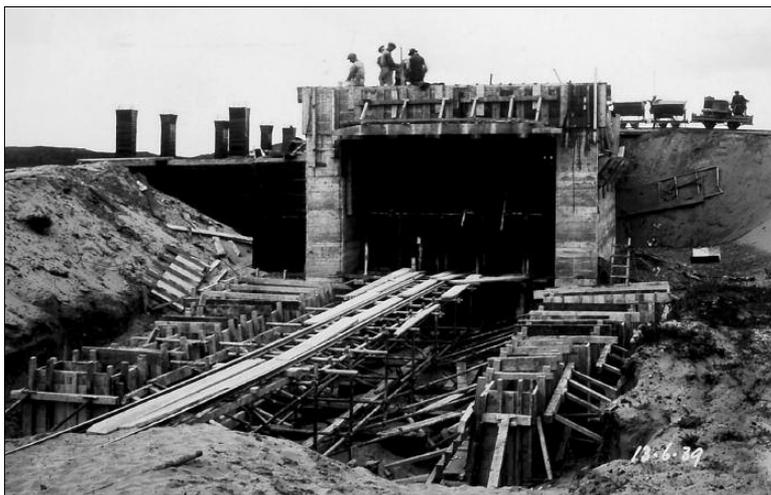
Photograph of magazine no. 8 under construction, dated 13/6/1939.
